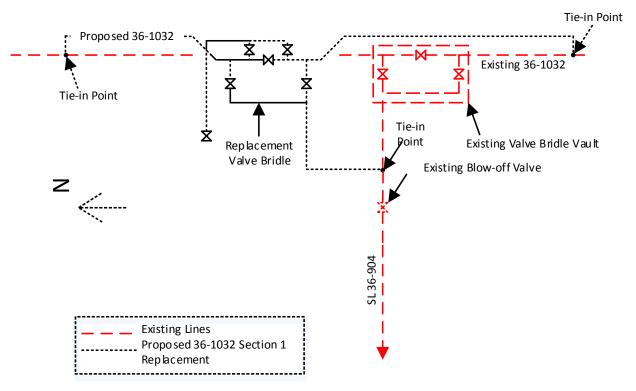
Stage 3 Proposed SL-36-1032 Section 1
